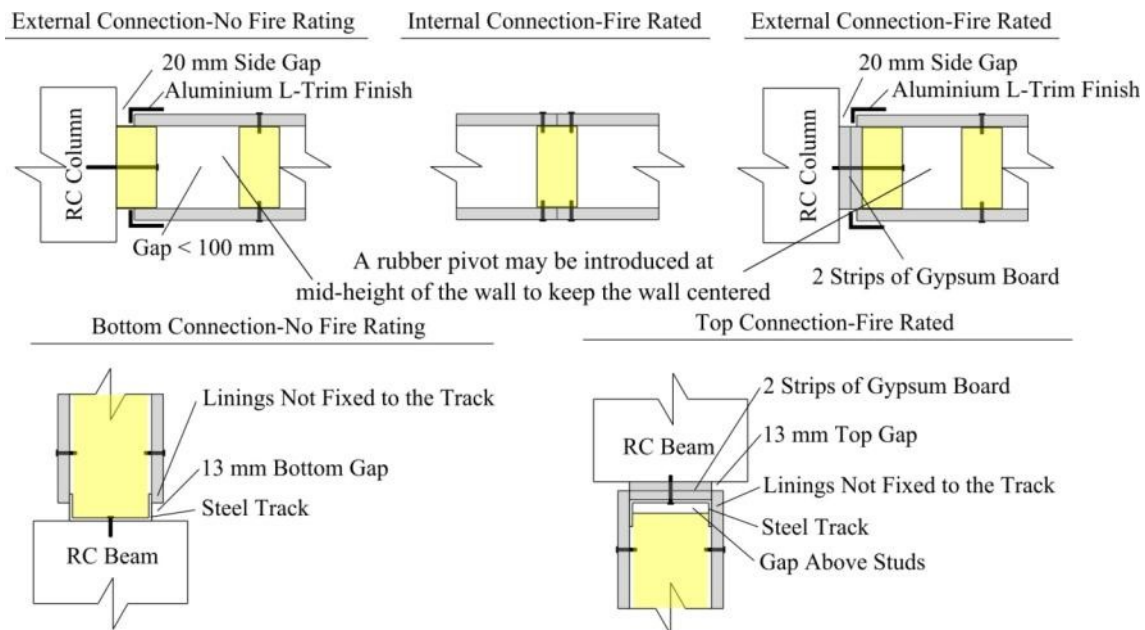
Adopted details in MIF2-TBFD (Low damage timber framed drywall) Note: The linings are only attached to the vertical studs
